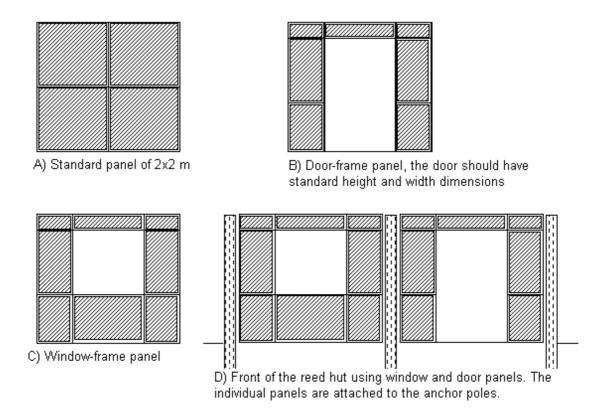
Illustration of the proposed prefabricated reed and forest timber panels to be used in hut construction.
